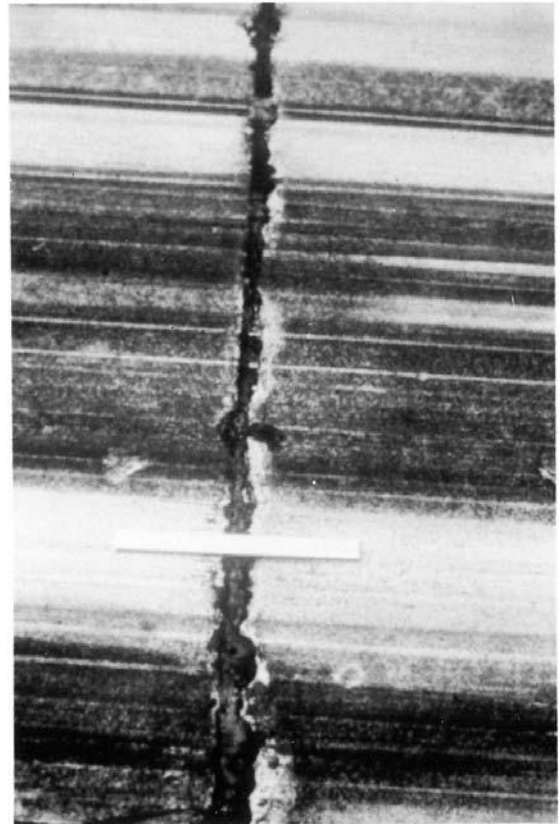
Low-Severity Joint Spalling (If the Frayed Area was Less Than 2 ft (0.6 m) Long it Would not be Counted)
